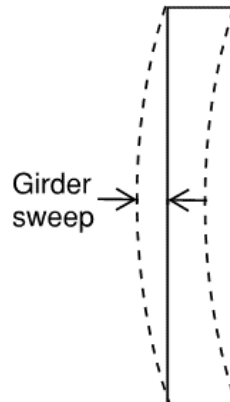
Girder Plan View Schematic Showing Horizontal (Sweep) Deflection
